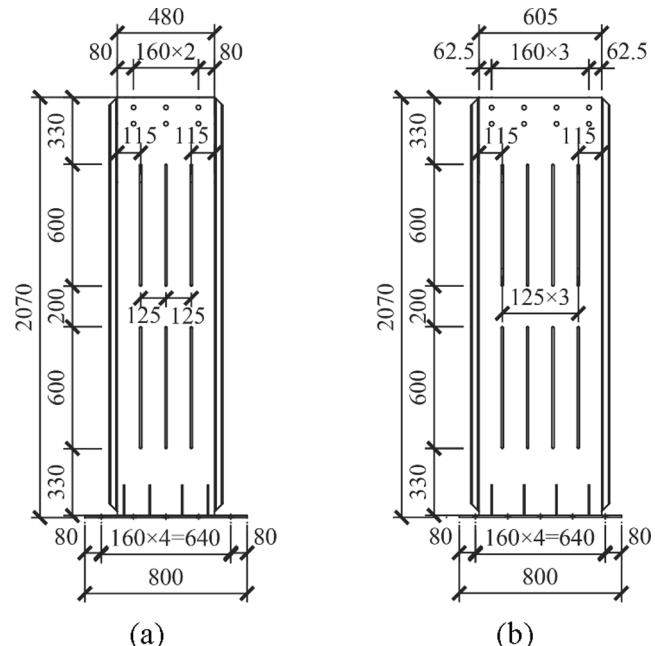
Dimensions and configuration of slit steel plate walls: (a) 1st-story SW; (b) 2nd-story SW.
